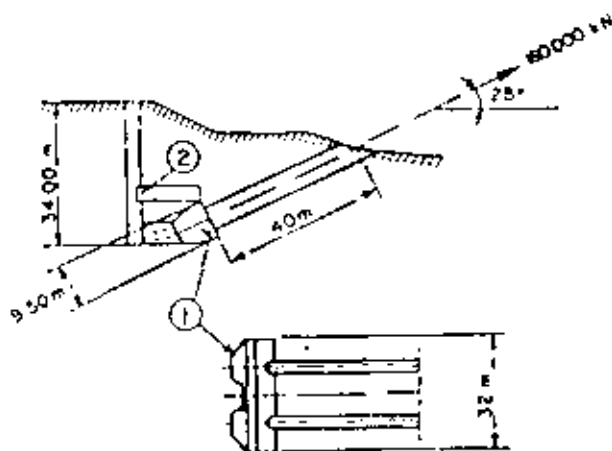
Anchorage of Tancarville suspension bridge, Right bank (Egoullan , 1961).
